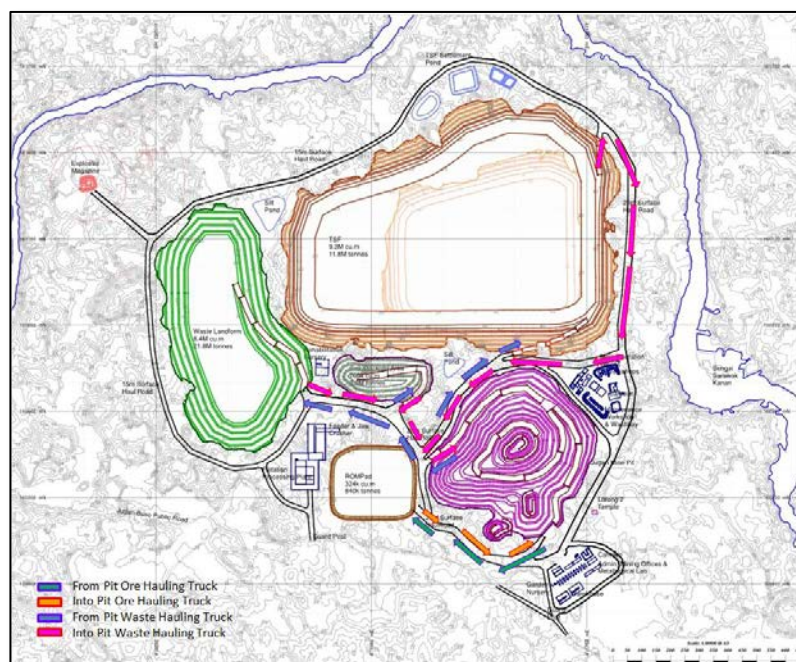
Jugan: Road and Ramp Configuration Option
